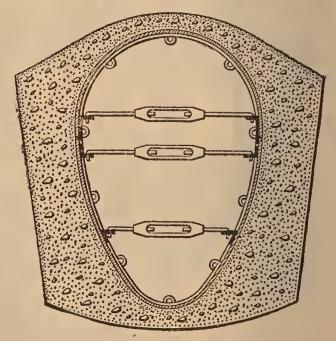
"Blaw" Centering for Egg-shaped Sewer.
